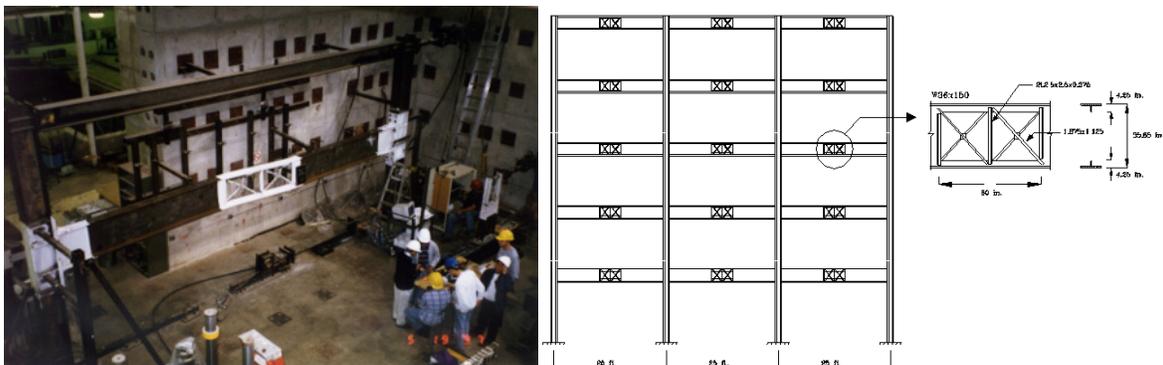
Frame modified with mid-span truss opening (Leelataviwat et al. 1998)
